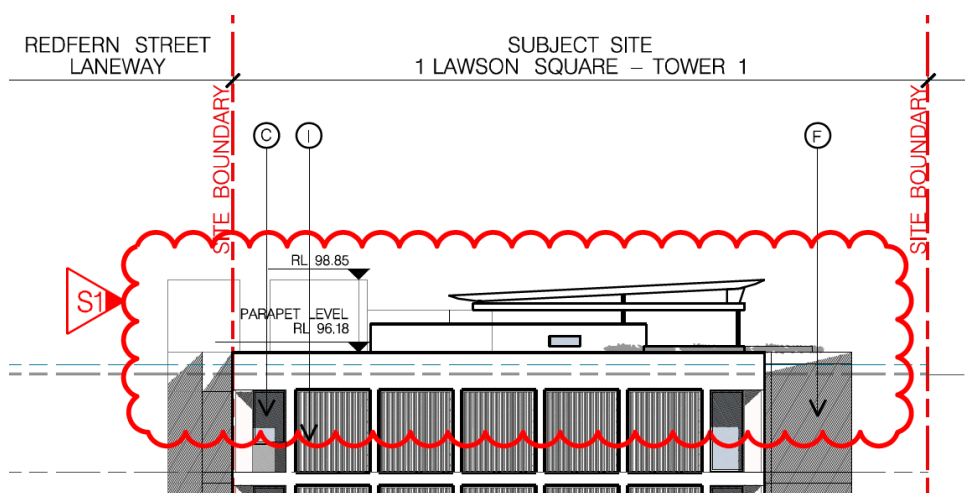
Eastern elevation of the proposed rooftop terrace, including privacy structure
